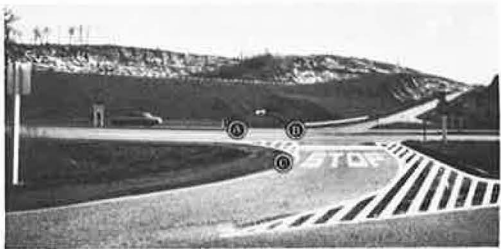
View of exit ramp with its left lane and junction with crossroad, marked A. Note the dark patches of unused pavement at flare and left edge and absence of one-way, do not enter, and wrong-way signs for the crossroad.
